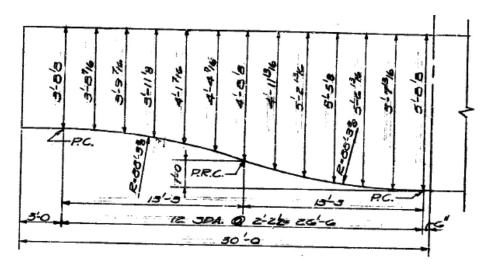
Girder web elevation at pier (INDOT, 1969).
